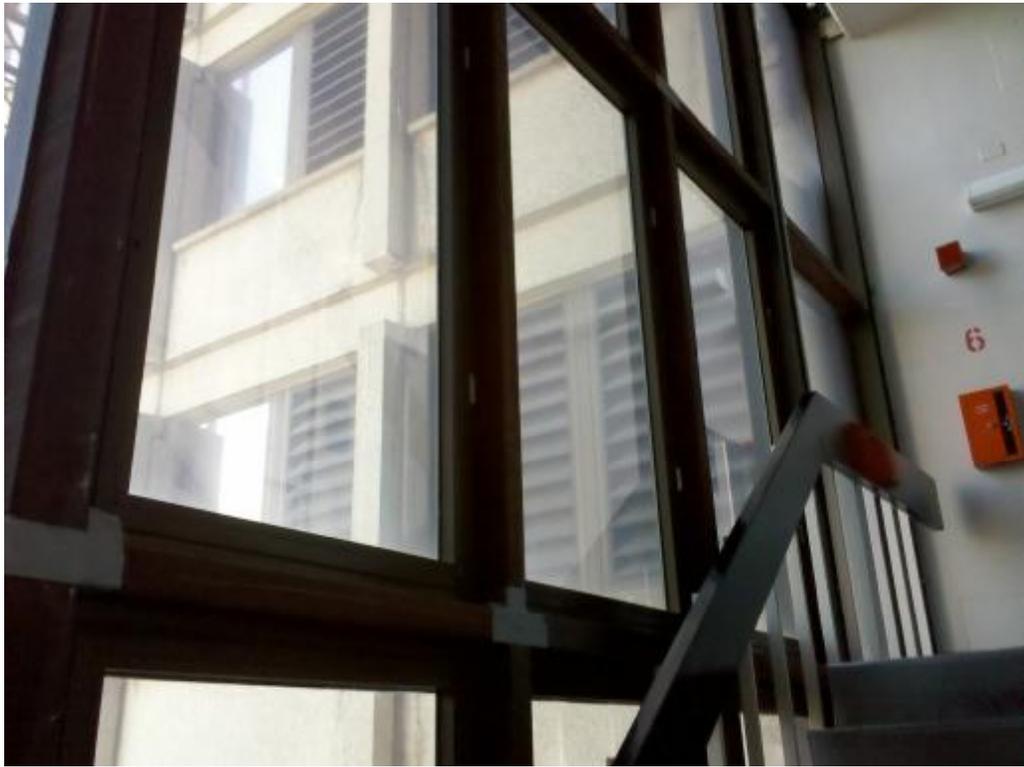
Close-up view of a high-rise curtain wall. Note the vertical “pilasters”, rectangular concrete ornamentations jutting out from the adjacent concrete wall.
